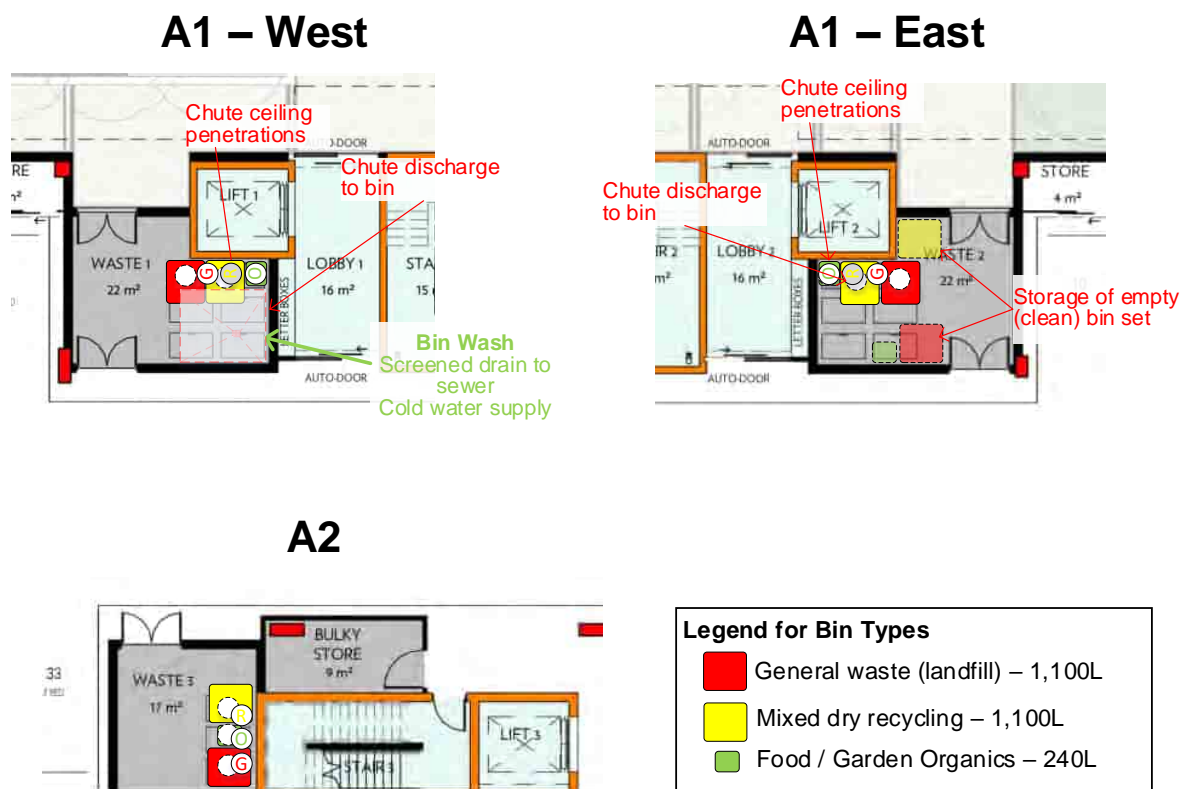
Bin storage rooms - Buildings A1 West, A1 East and A2.
